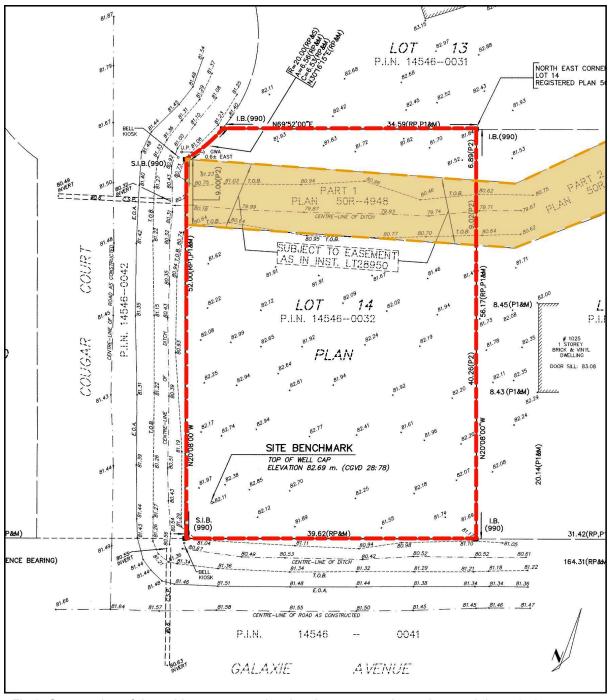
Survey plan of the subject property showing the property boundary and the existing easement containing the drainage ditch.
